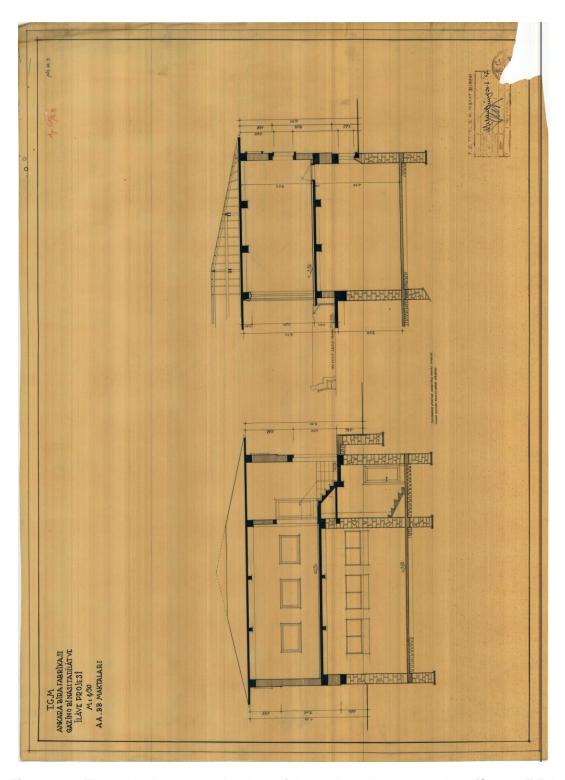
The original proposed drawings of the workers club, the sections (Source T.T.A Archive)
